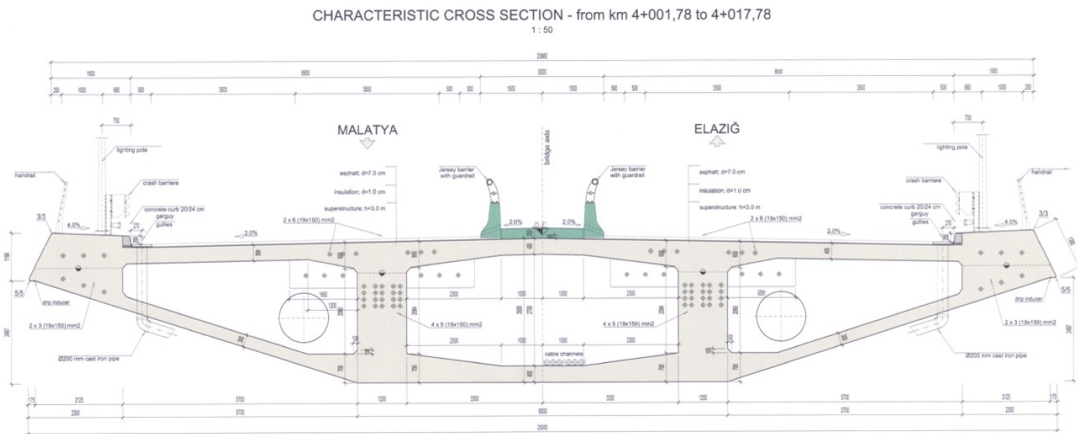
Cross-section of transition of support-4 and abutment-5.
